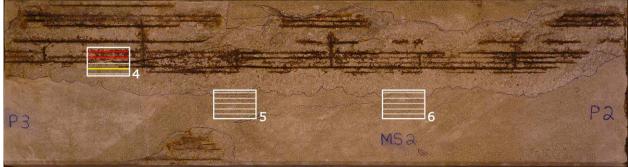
Location of 2<sup>nd</sup> Layer Punch outs on Beam MS2
